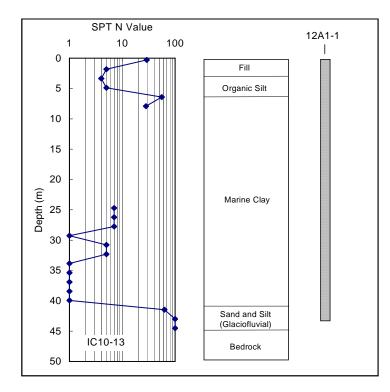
Soil profile at the contract C09A4 site as encountered in Boring IC10-13.
